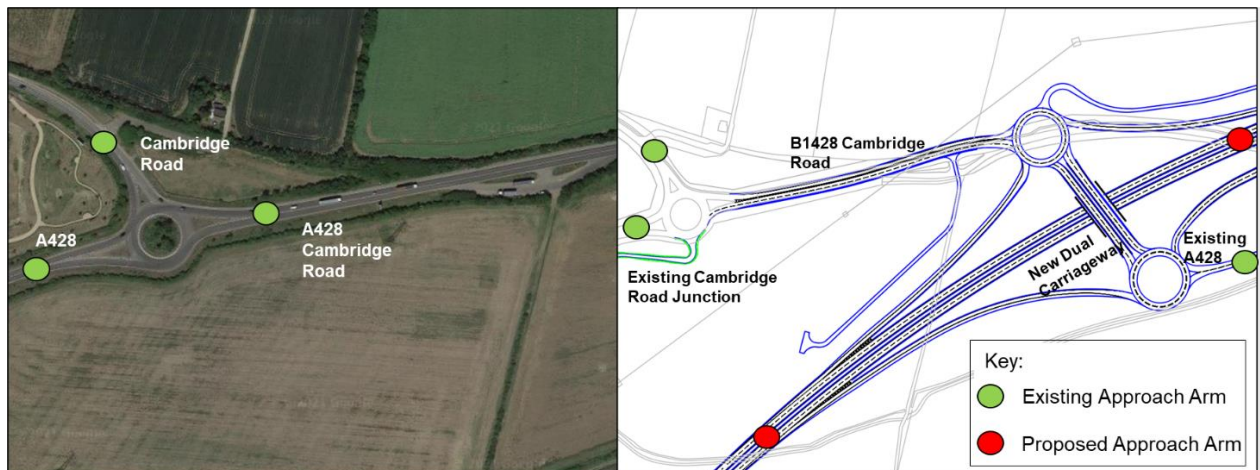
Origin/ Destinations at existing and proposed Cambridge Road Junction
